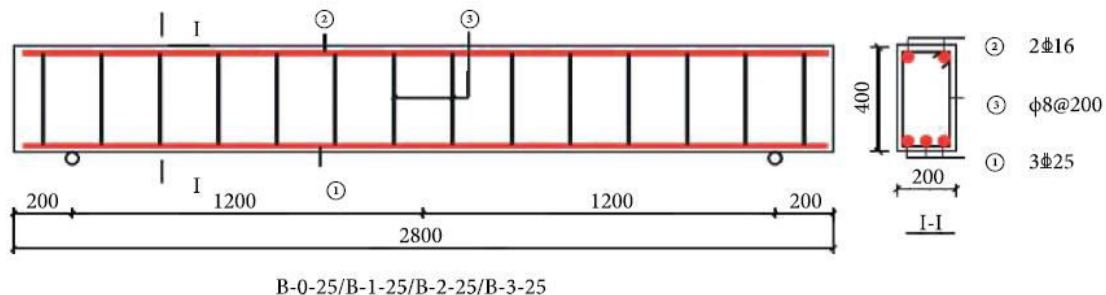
Dimensions and Reinforcement layout of RC and SFRC beam
